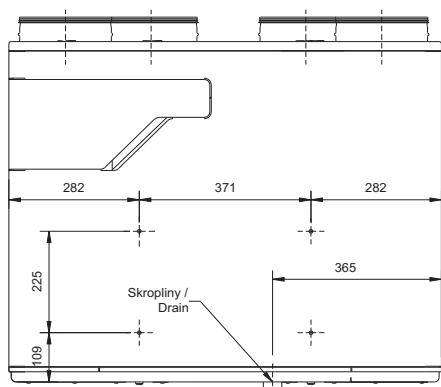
Arrangement of mounting points. Front view of the BLAST device.
